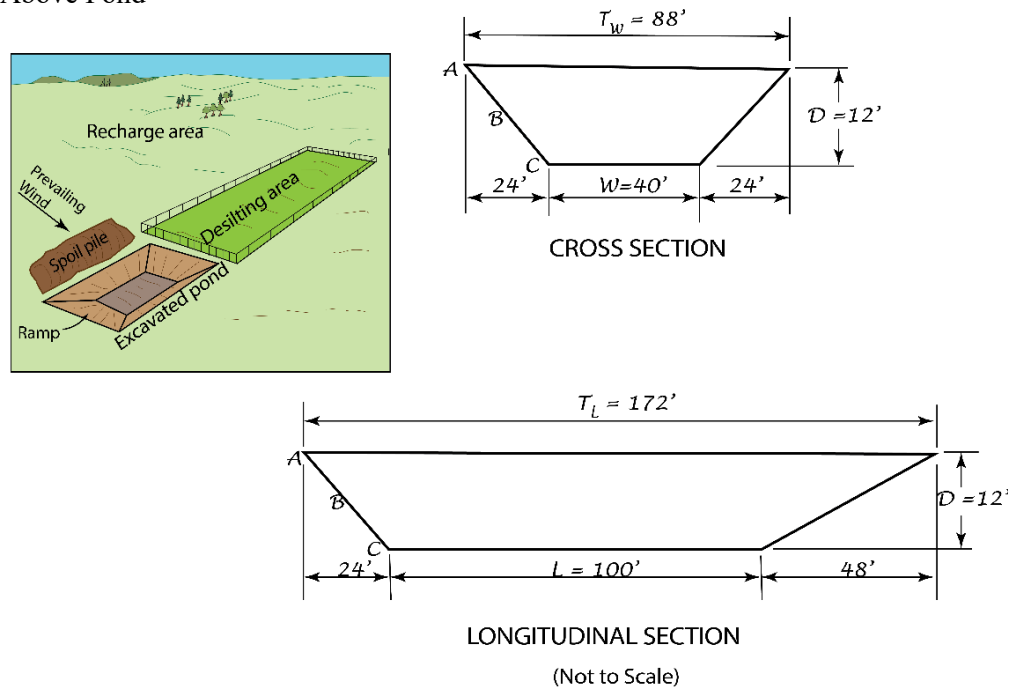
Cross Sections of Excavated Pond Showing Methods of Waste Material Disposal
